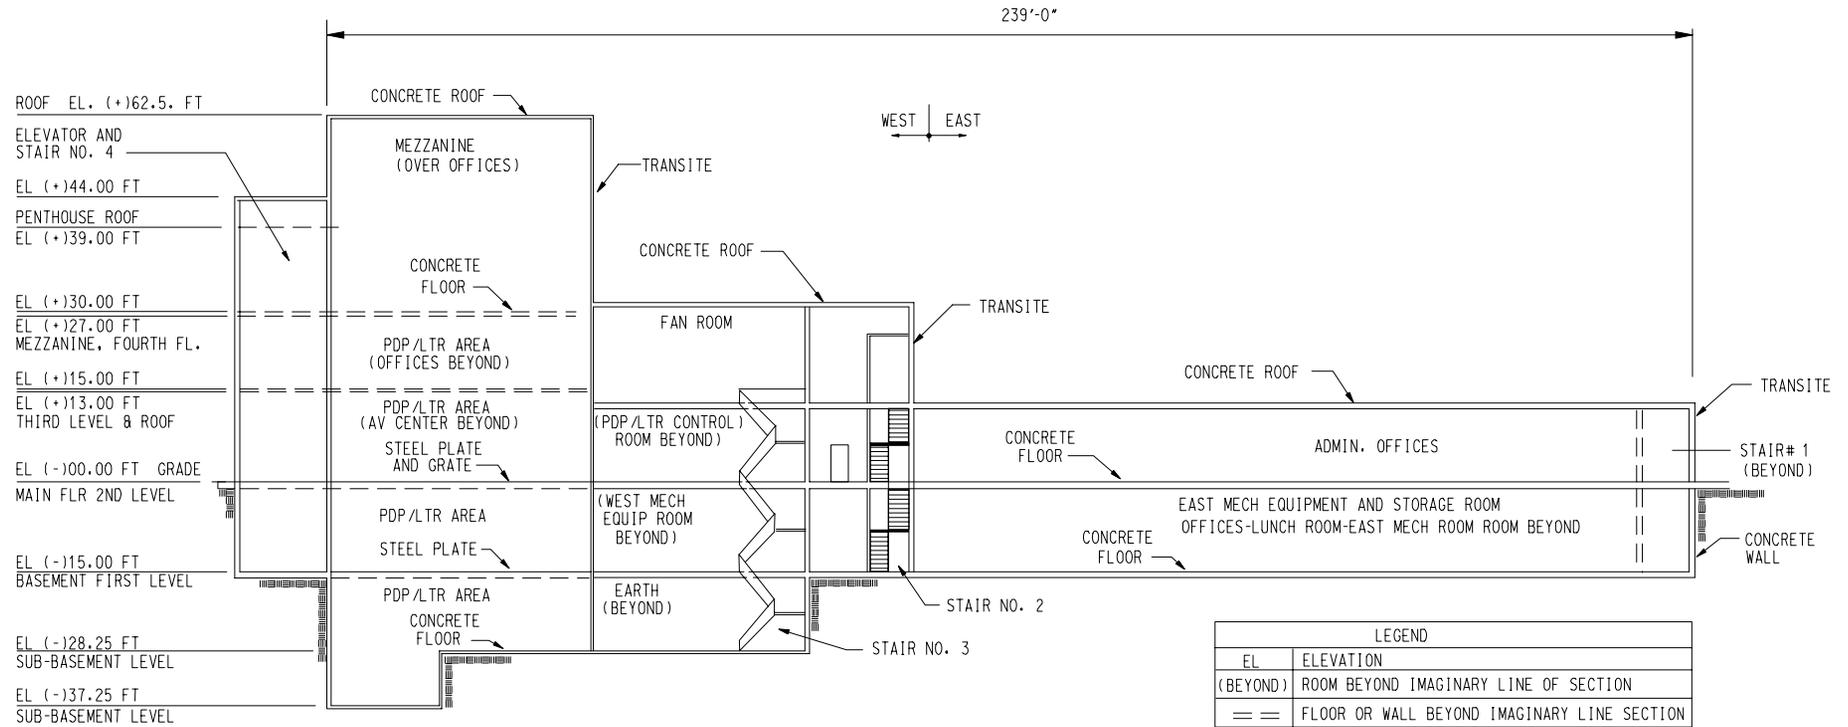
Longitudinal Cross-Section of Building 777-10A
